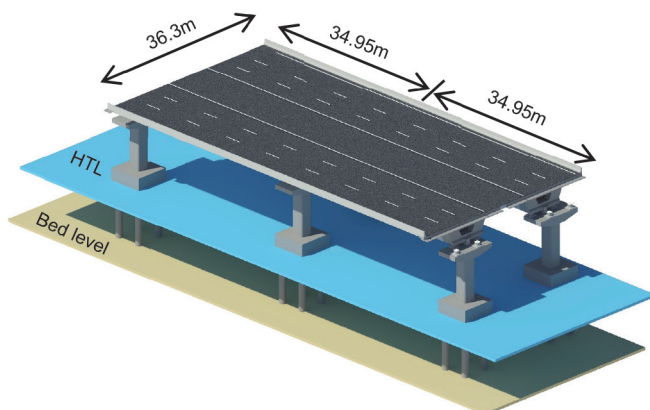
Structural Arrangement - 3D Perspective view of Emergency Rescue Area with extended box girder
